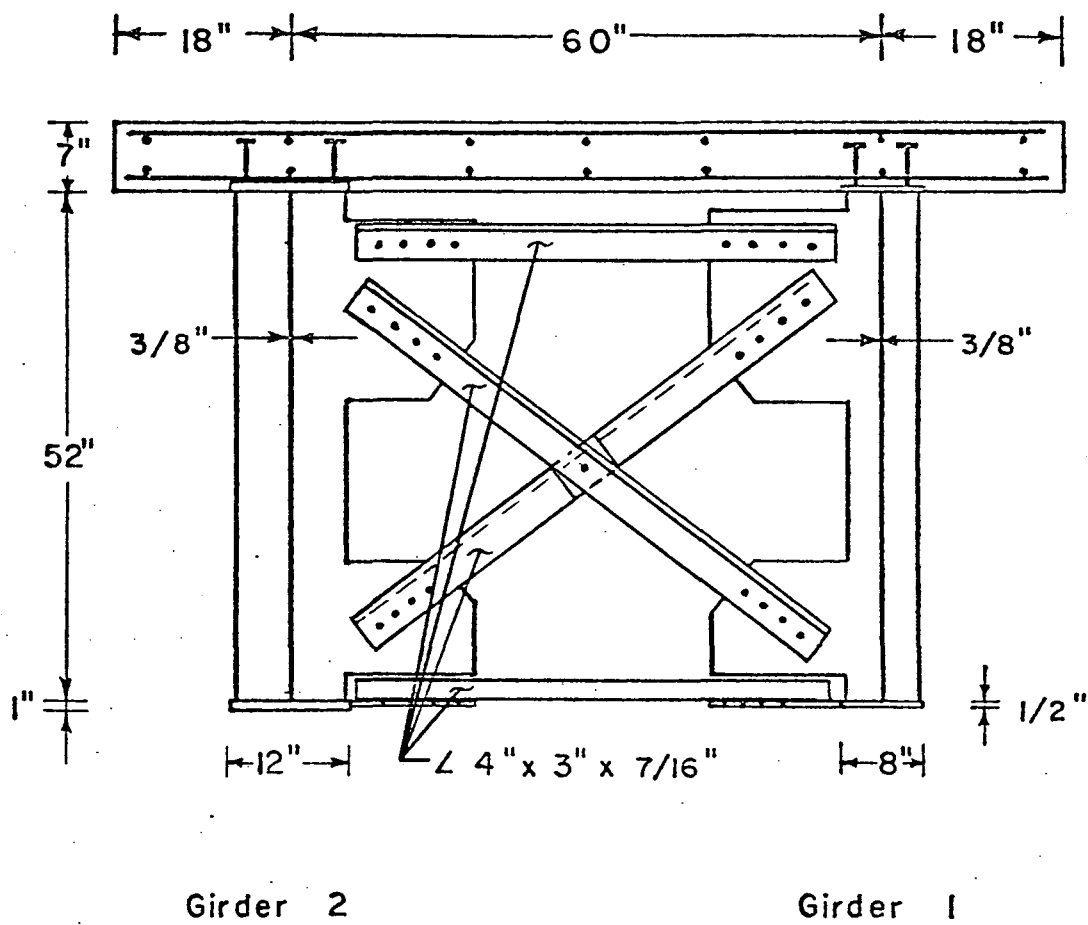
Typical Diaphragm Section of Composite Assembly 4
